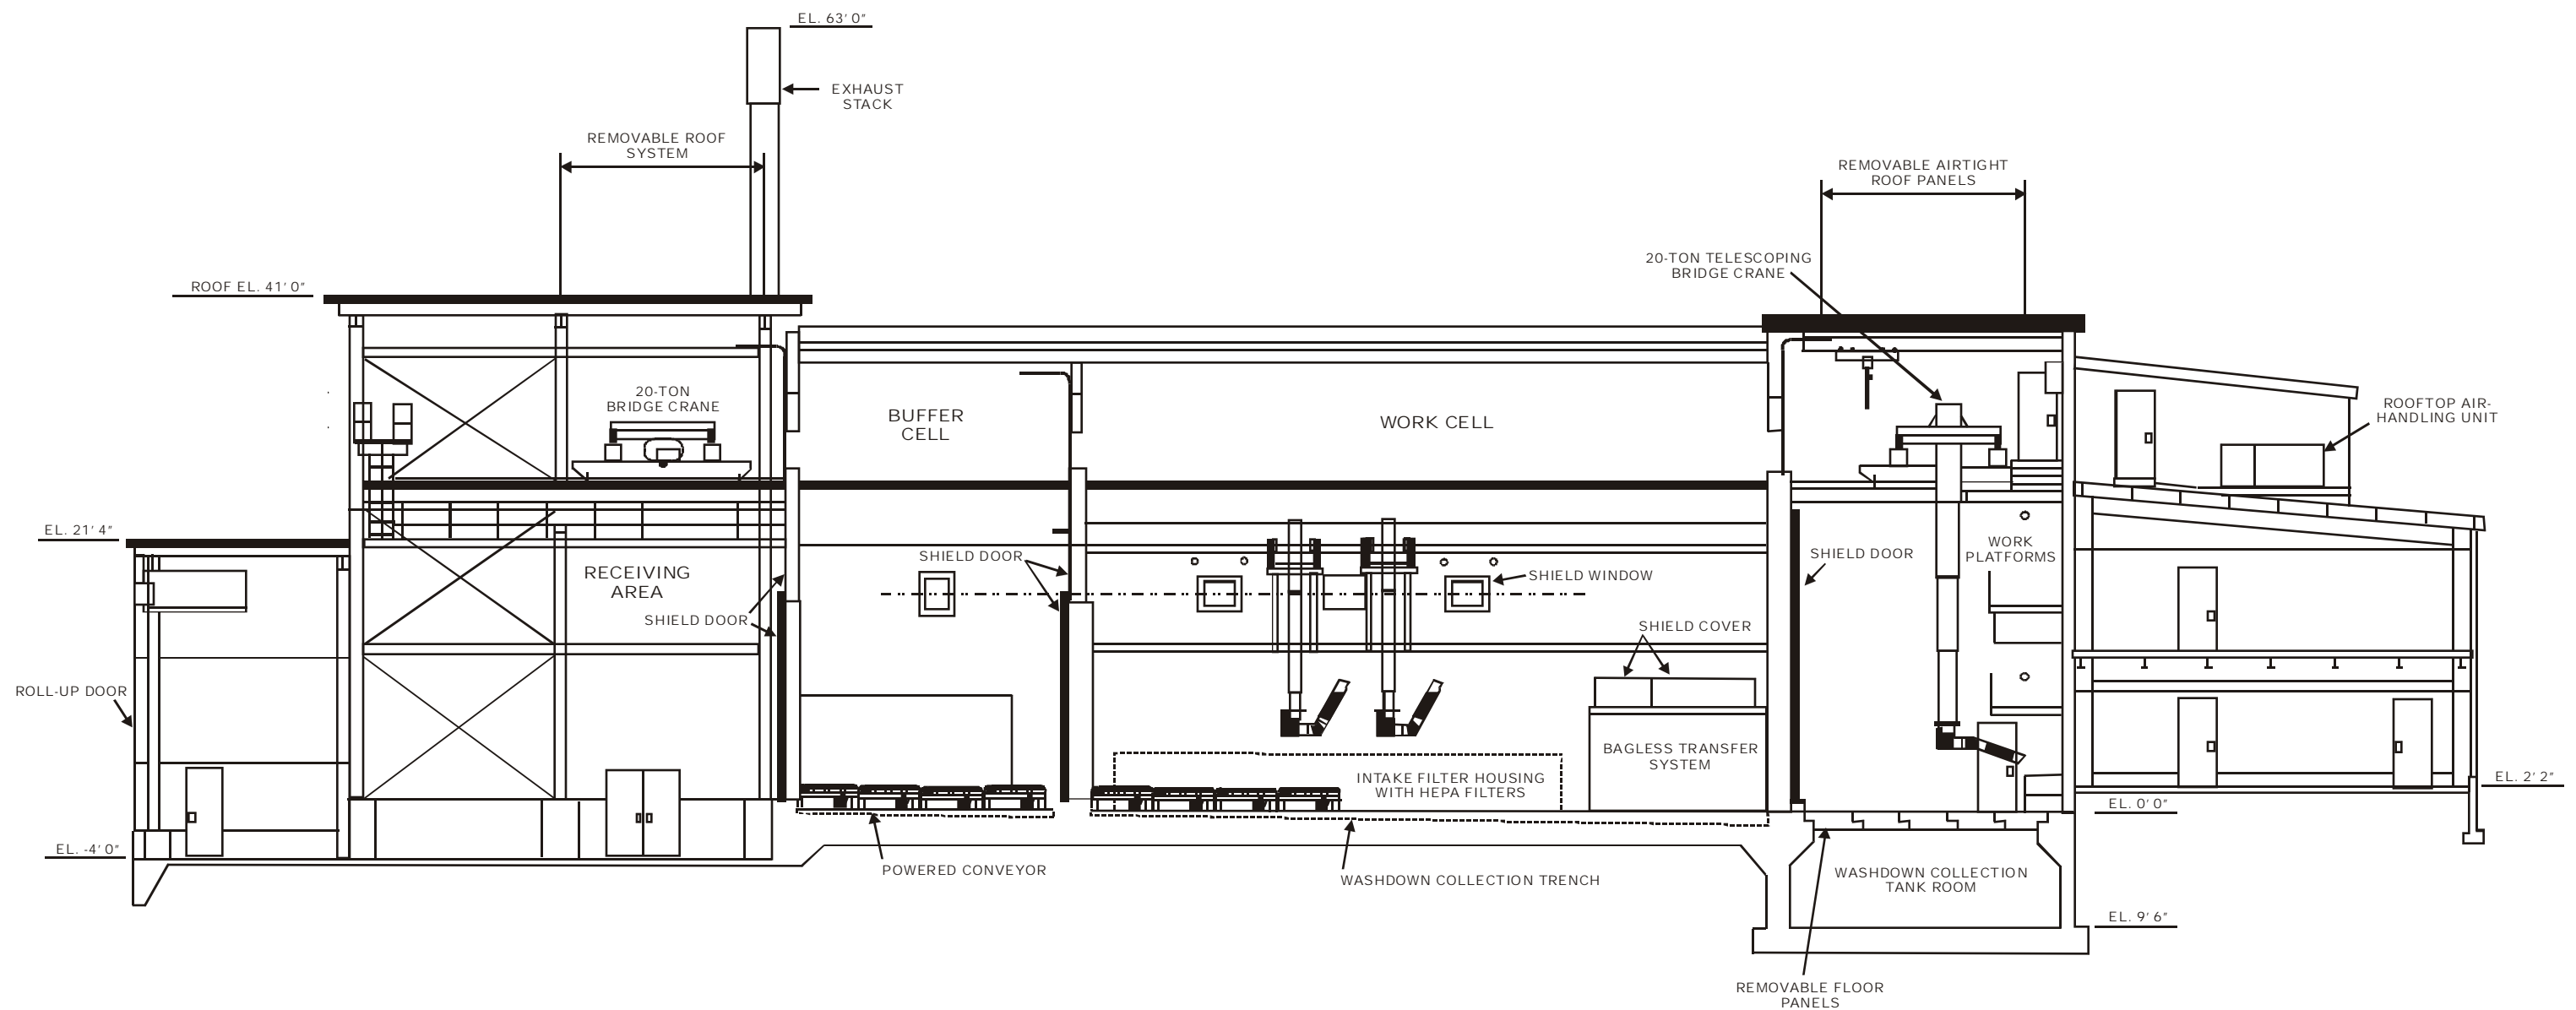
A Schematic of the RRHWF Plan at the WVDP—June 1999 Conceptual Design (Adapted from RRHWF Drawing Number SK-4307-042-001, Sheet 2, Rev. B)
